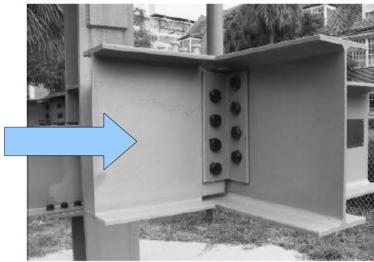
Shear Connection: All-bolted double-angle Girder B1 / Beam B1B
